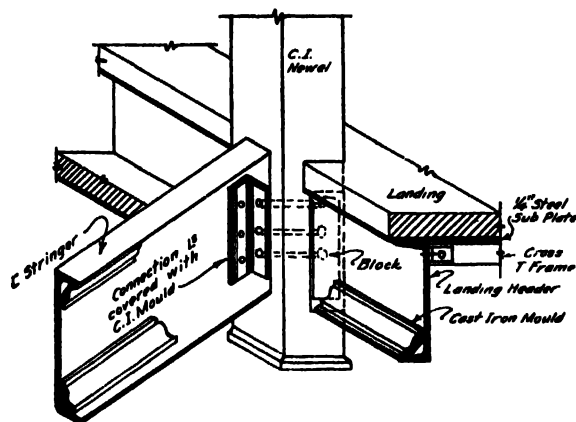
ROLLED CHANNEL STAIR STRINGS
